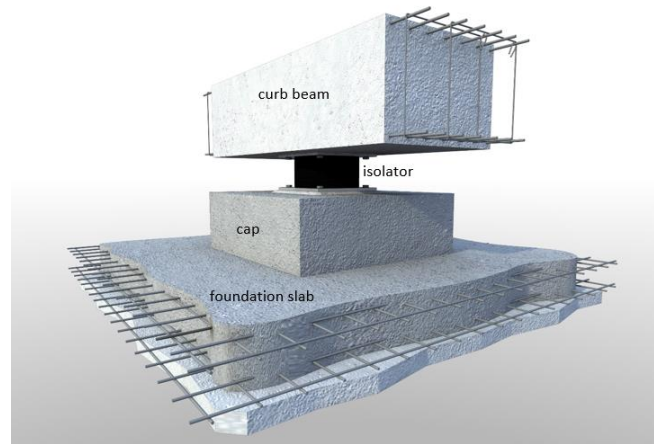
New elements at the base of the isolated building: foundation slab, cap, isolators, curb beams.
